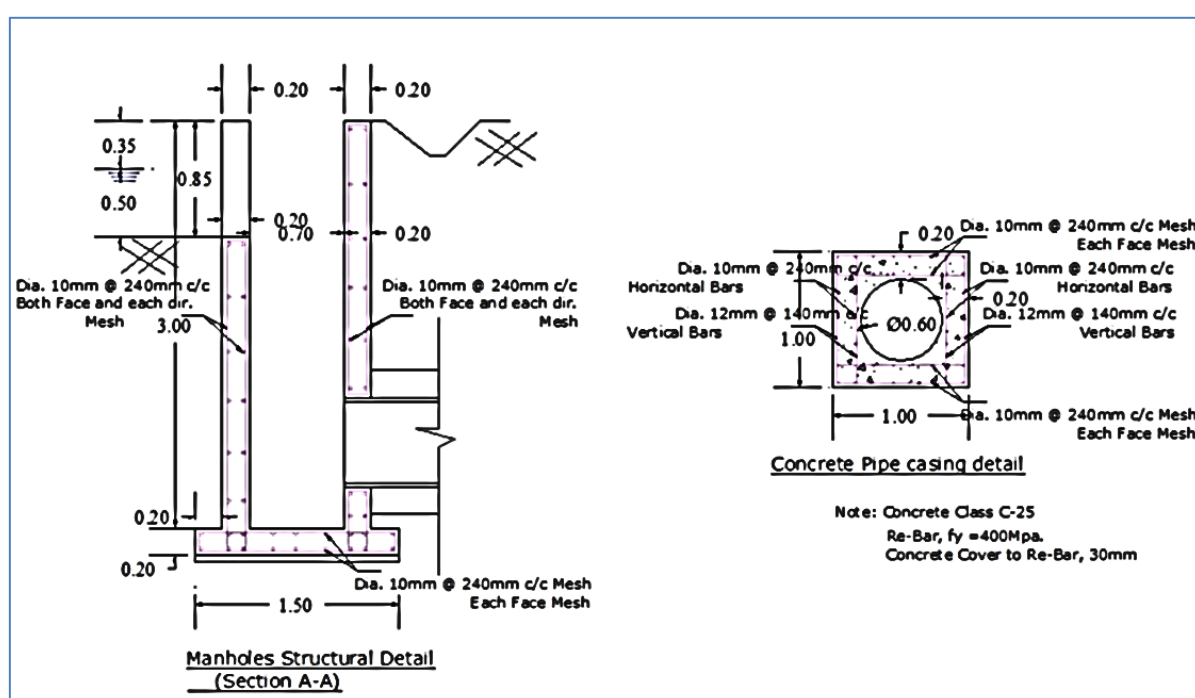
Inverted siphon inlet, outlet manholes and pipe casing structural detail
